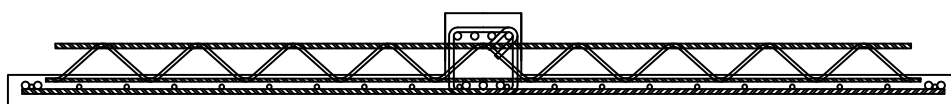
Cross-section of the bottom slab with a concrete stabilizing beam
